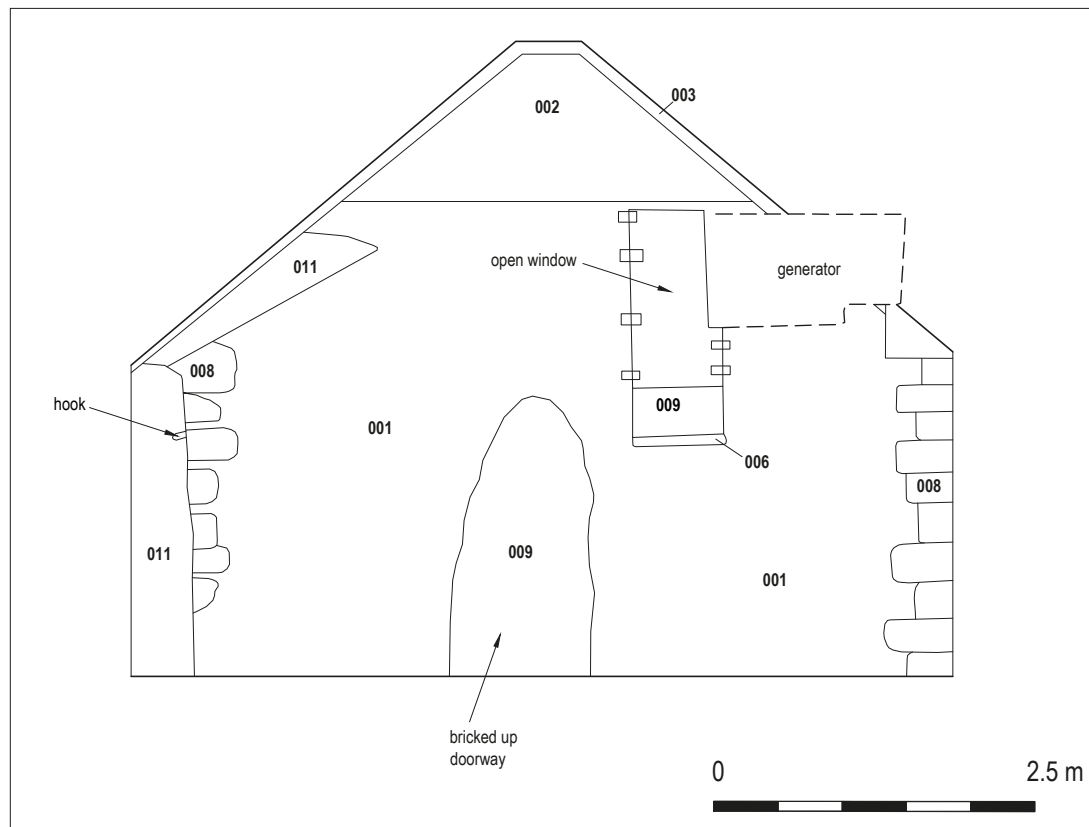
Eastern gable end of Building 2 (Farmhouse)
